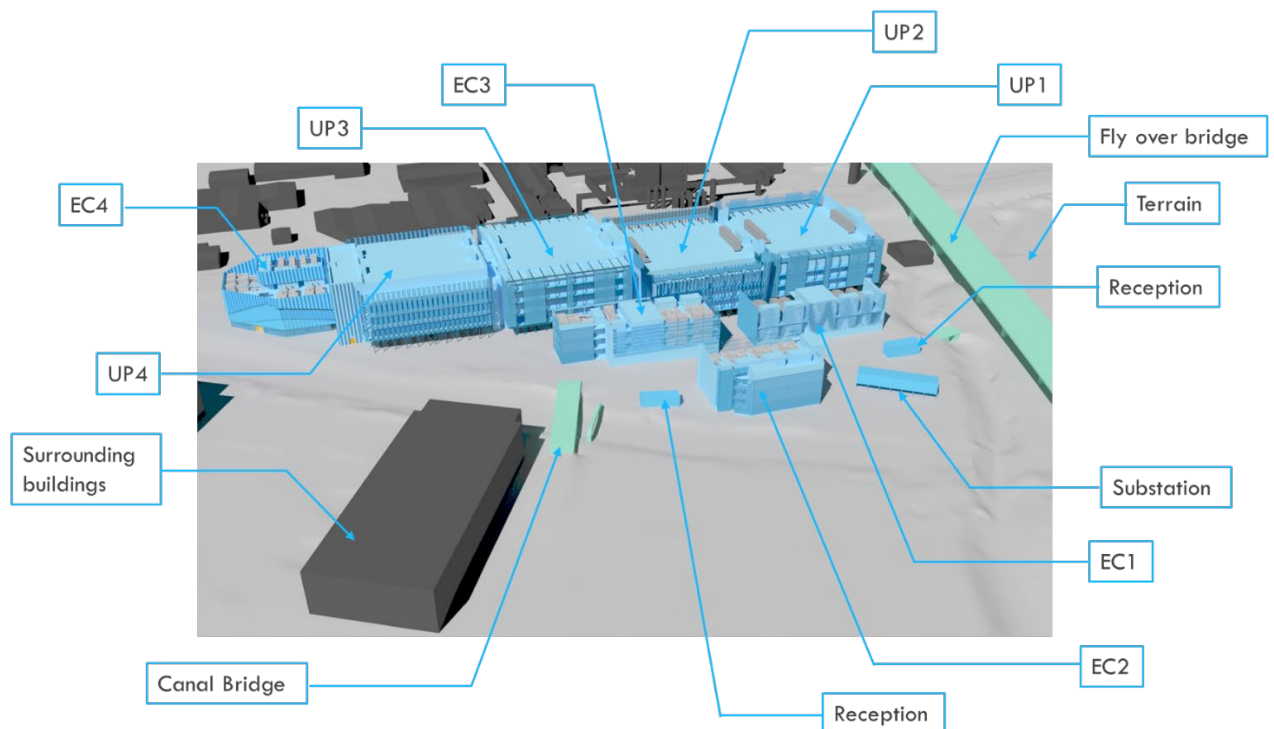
North close-up perspective view of the modelled proposed Union site and surrounding buildings.
